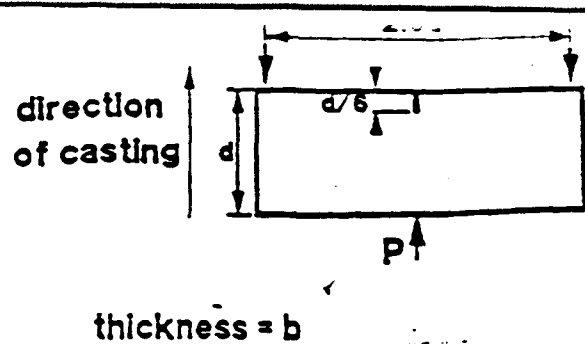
Geometry of the three-point-bend fracture specimens tested
